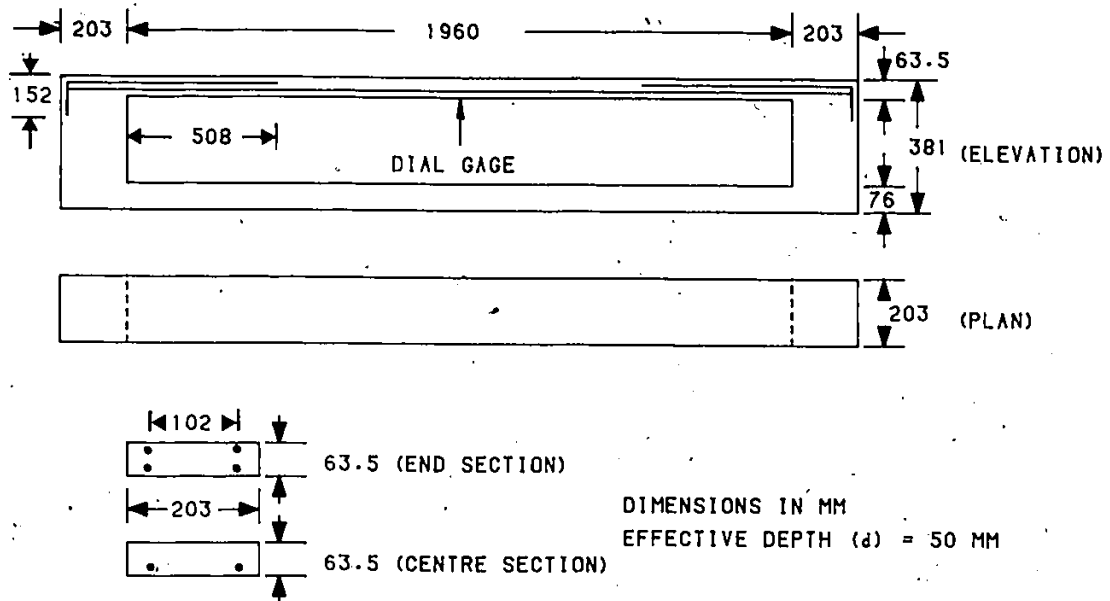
DETAILS OF ONEWAY SLAB MODELS
